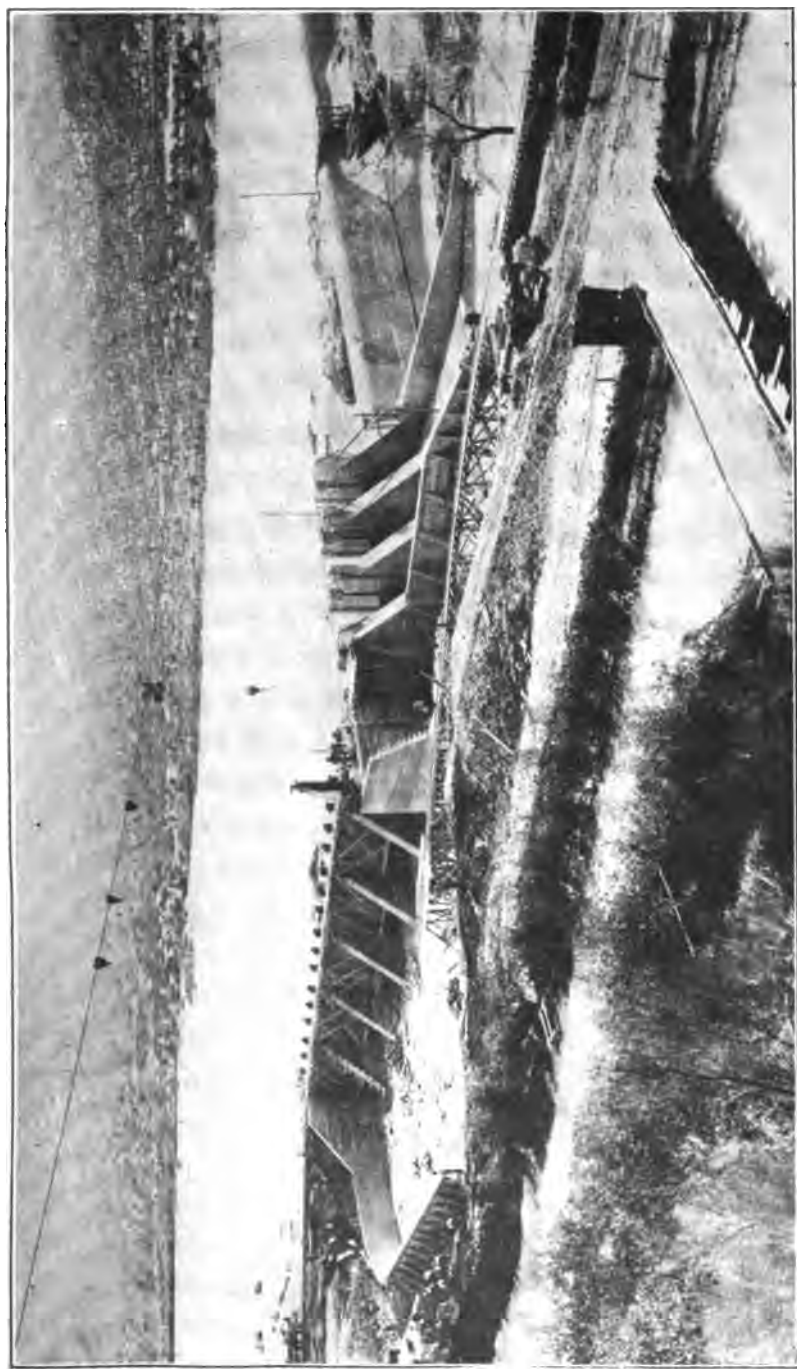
PLATE IX.—Granite Reef Weir, Northside Regulator and Sluiceway, Salt River Project, Arizona.
